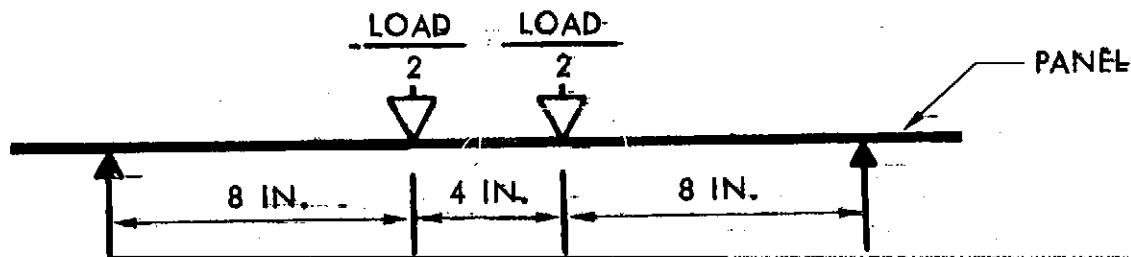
Panel Stiffness Test Loading Arrangement.
